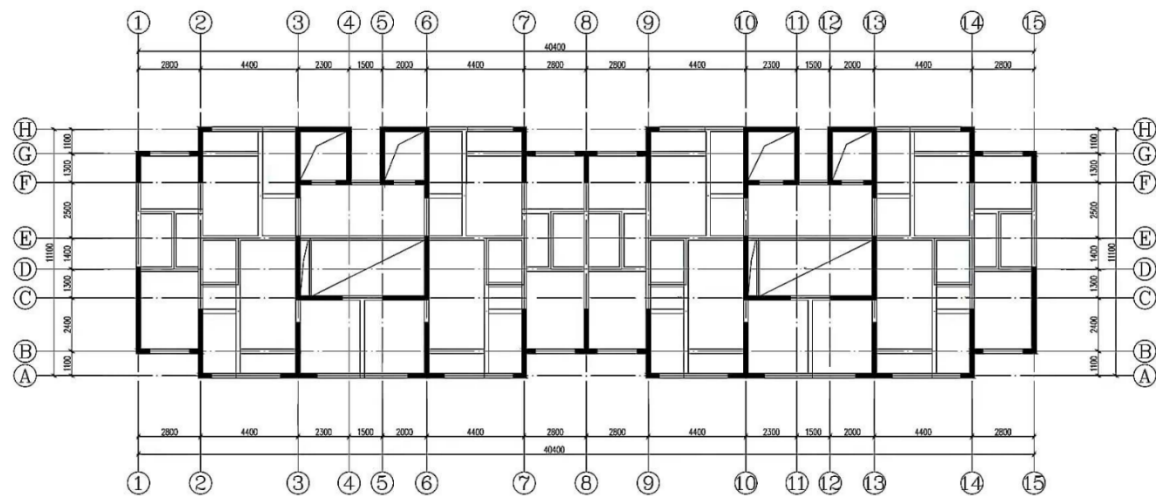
2-15 layer beam structure plane dimensions 1:100.
